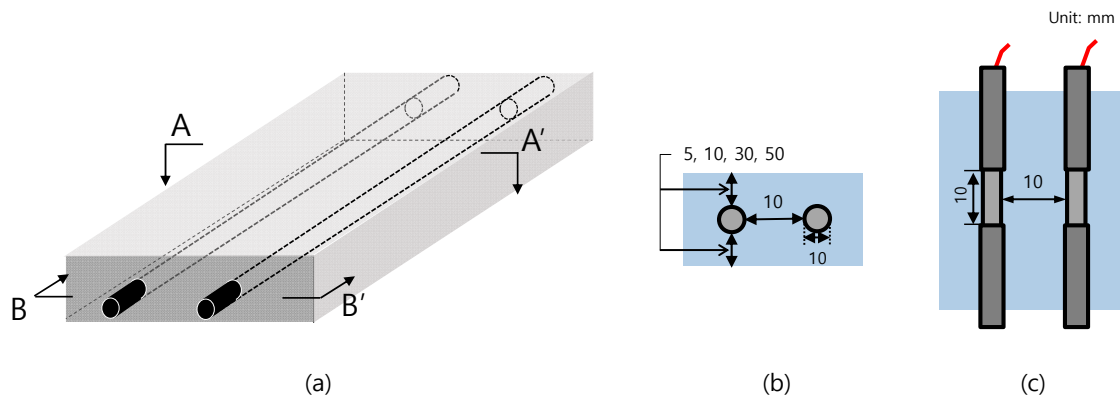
The (a) isometric view, (b) sectional view A–A', and (c) sectional view B–B' of the specimen configuration of reinforced steel in a concrete specimen.
